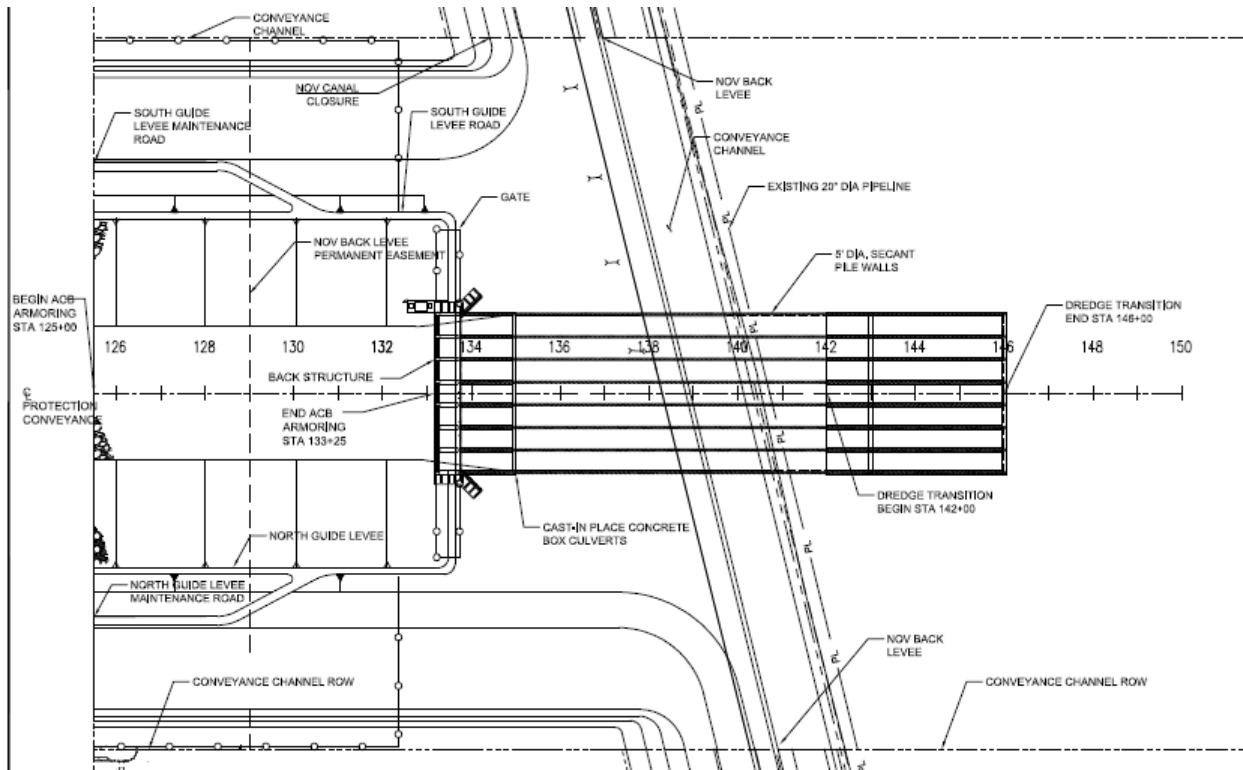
Alt. C – Plan View of the Back Structure, Submerged Box Culverts & Transition to the Barataria Basin
